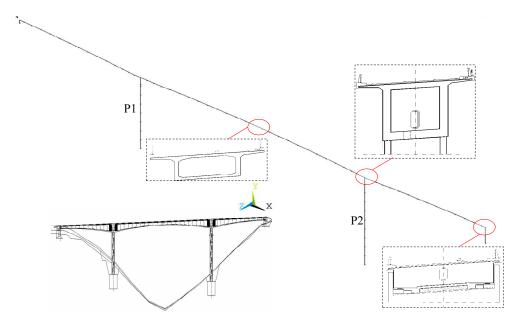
Layout of the bridge configuration and finite element model; inserts in Figure are the deck section (a) in the middle of each span, (b) on top of the piers and (c) on the top of the abutments.
